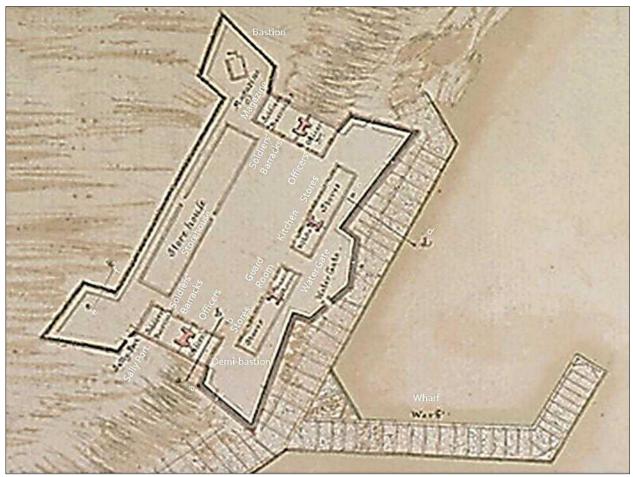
Detail of Plan of Fort Erie, *Built under the Direction of John Montressor*, *Engineer*, *1764*. By Francis Pfister, 1766 showing rectangular trace of fort and labelled buildings within. The wharf and waterside pier are drawn in detail.
